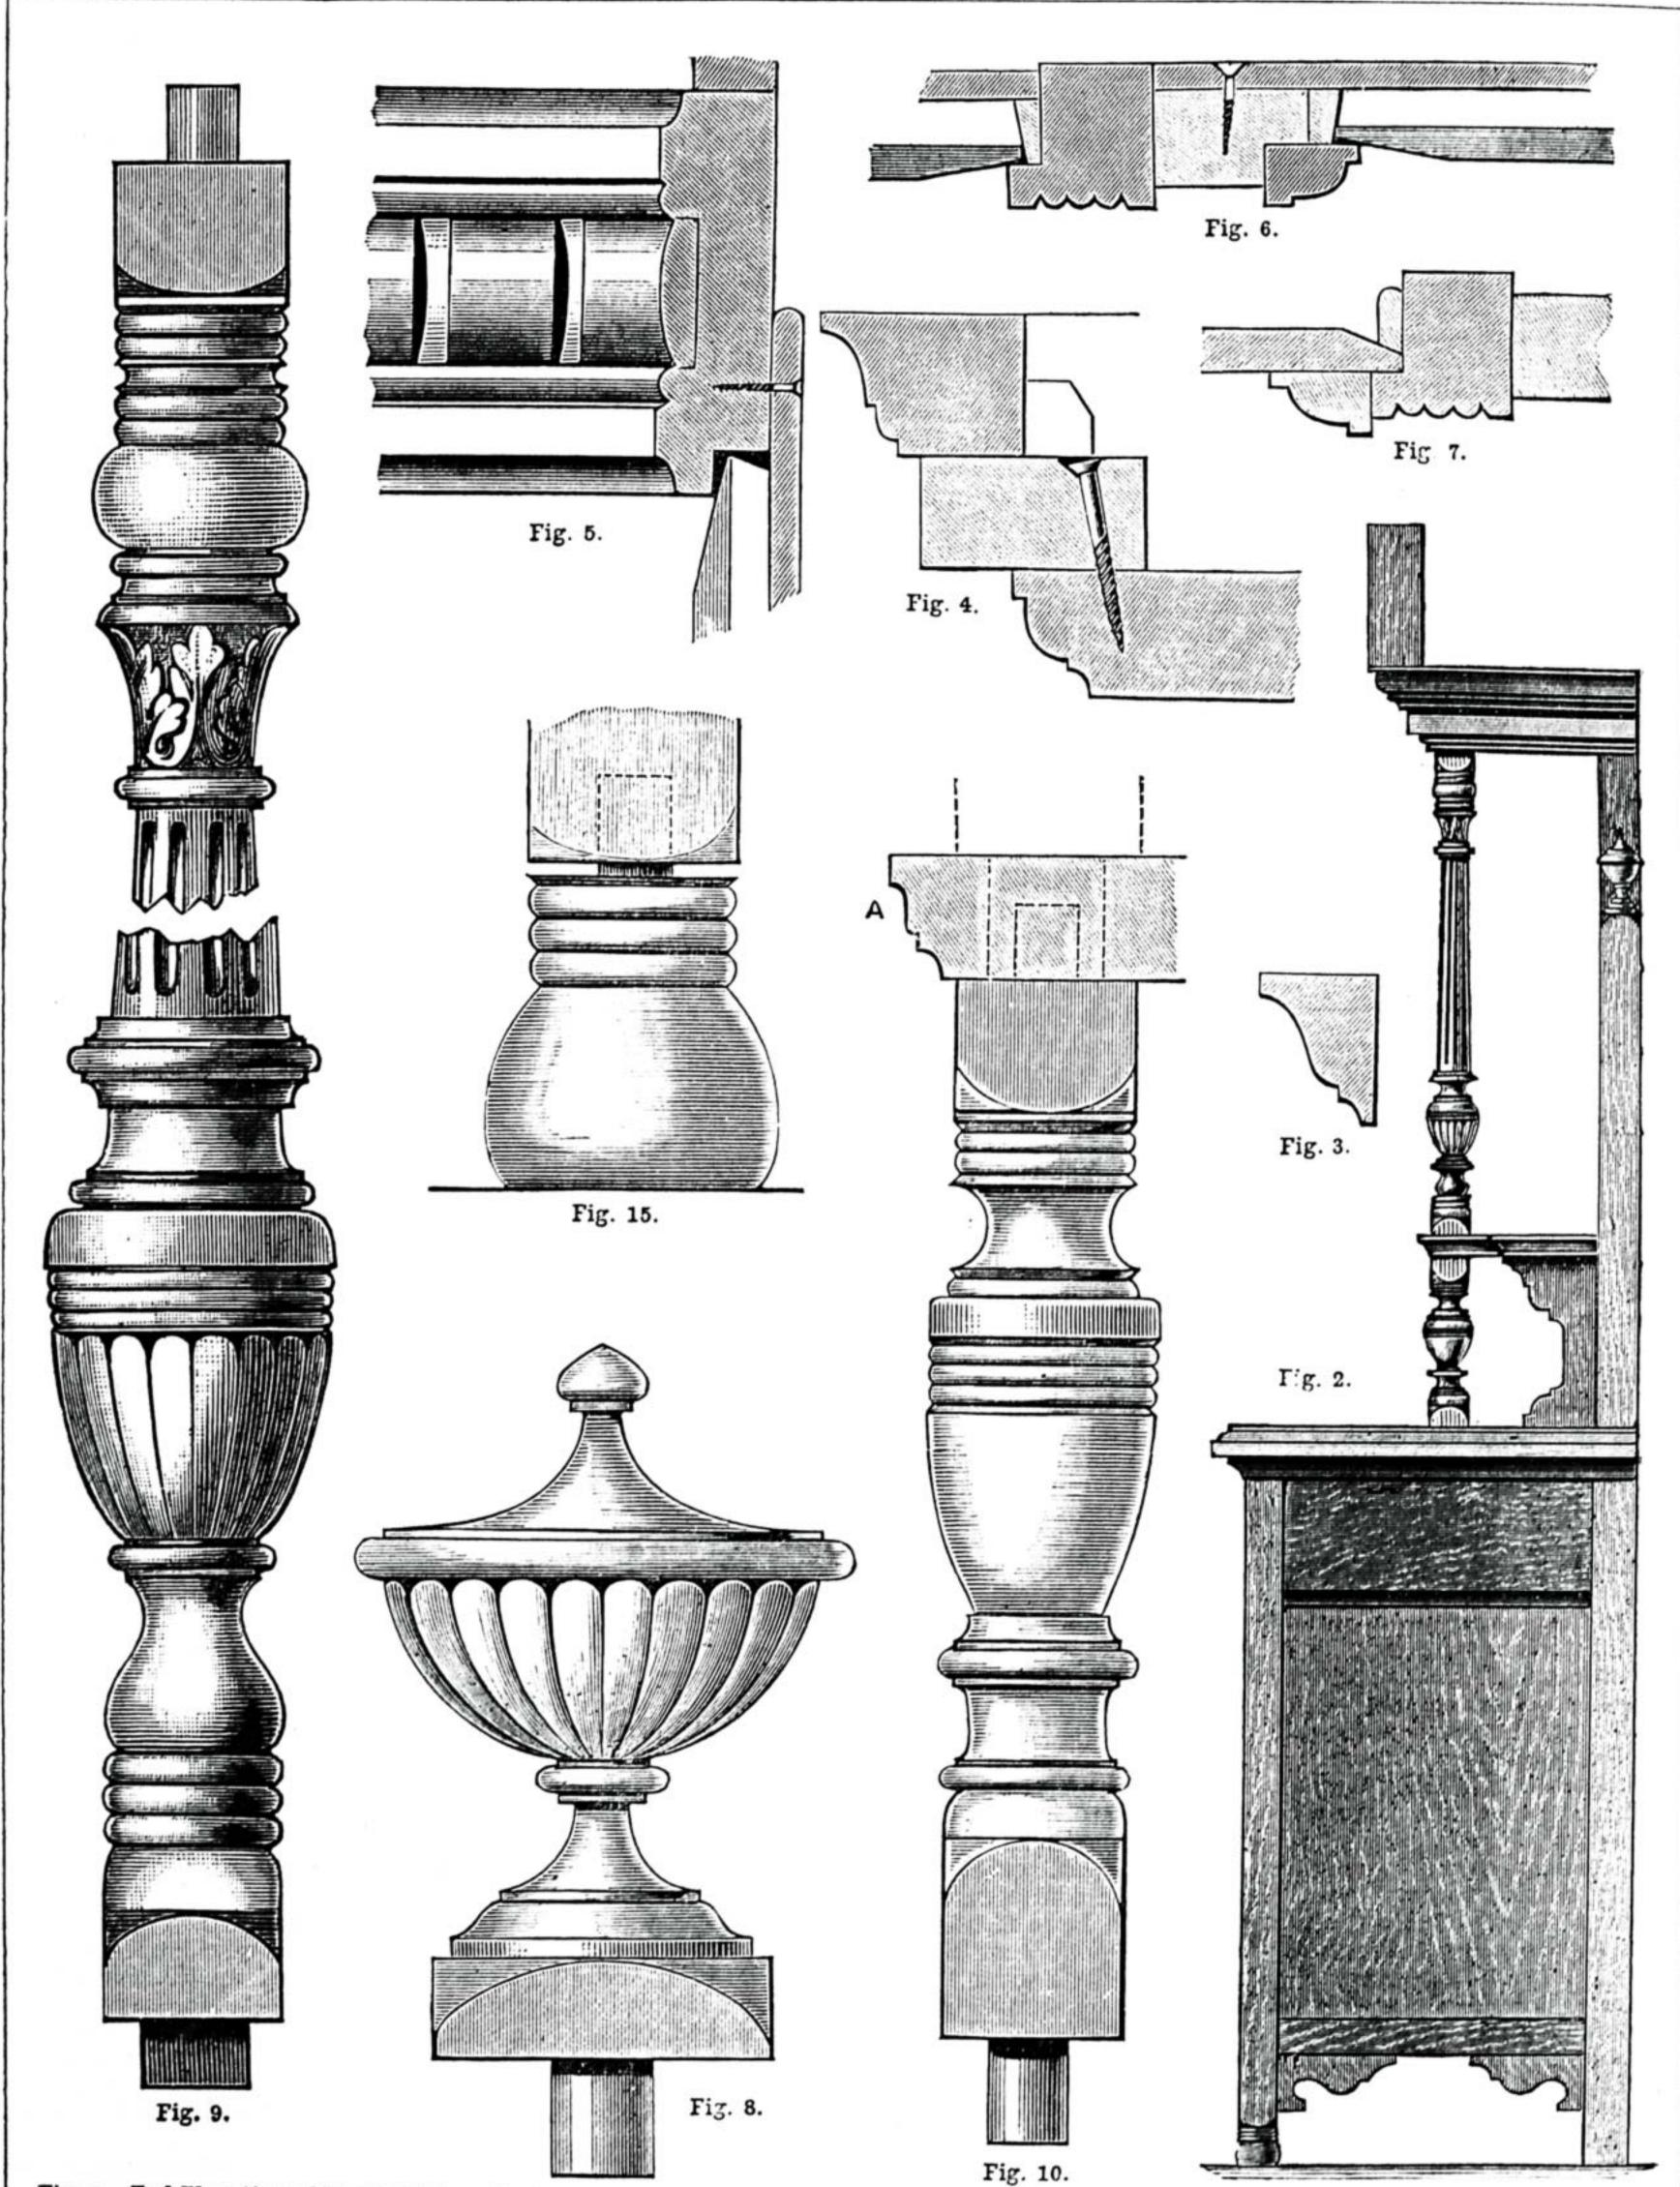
End Elevation of Small Sideboard: Scale, one-twelfth size, or 1 inch to 1 foot. Fig. 3.—Section of Moulding used in Pediment. Fig. 4.—Section of Cornice. Fig. 5.—Rail above Side Glasses in Elevation and Section. Fig. 6.—Section of one of Centre Posts, etc. Fig. 7.—Section of Post and Side Panel under Shelf, with Planted Moulding. Fig. 8.—Turned Finial in Centre of Pediment, and Pattern for Turned Knobs above End Posts. Fig. 9.—Turned Pillar supporting Roof and resting on Shelf. Fig. 10.—Turned Pillar supporting Shelf—A, Moulding of Shelf. Fig. 15.—Turned Foot for Cupboard.
